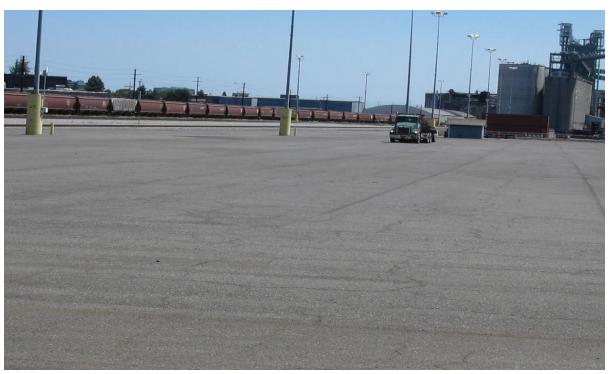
Former plant area and engineered asphalt cap—form the Northwest.
